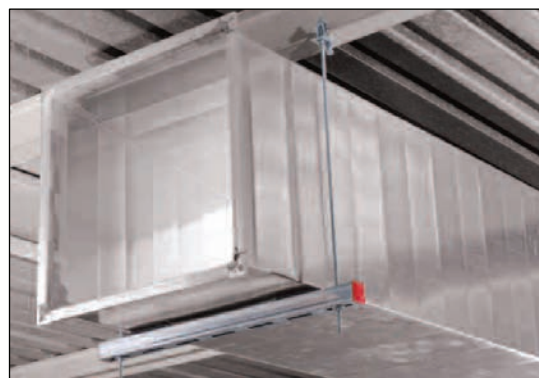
Rectangular ductwork suspended from a steel beam. Beam clamps, threaded rod and a profiled channel system have been used for this support configuration.
